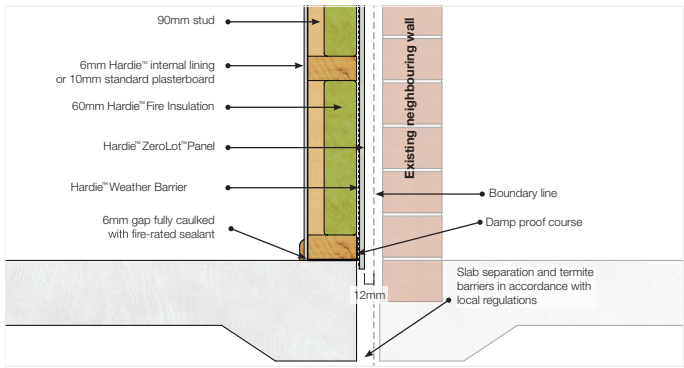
SLAB DETAIL FOR SINGLE BOUNDARY
